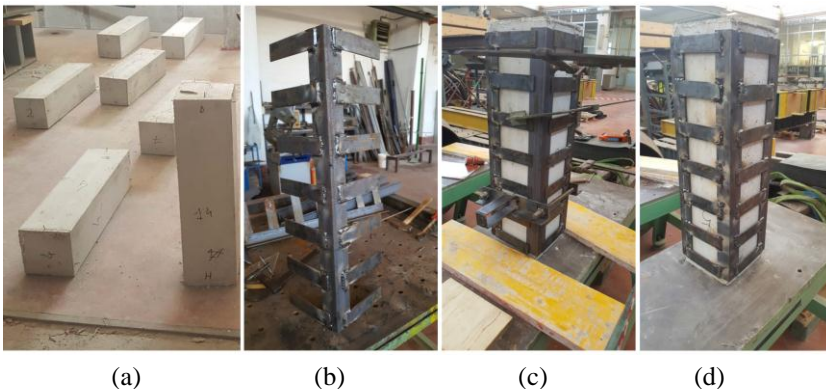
Plain concrete specimens (a); component of a steel jacket before the application (b); fixing of a steel jacket to a concrete specimen before final welding (c); welded jacket in the final configuration.
